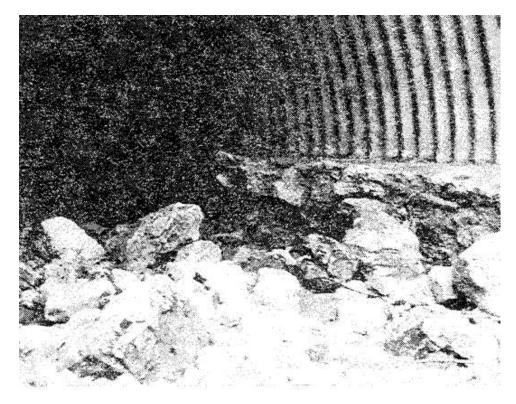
(Exhibit 78) Erosion of Invert Undermining footing of Arch
